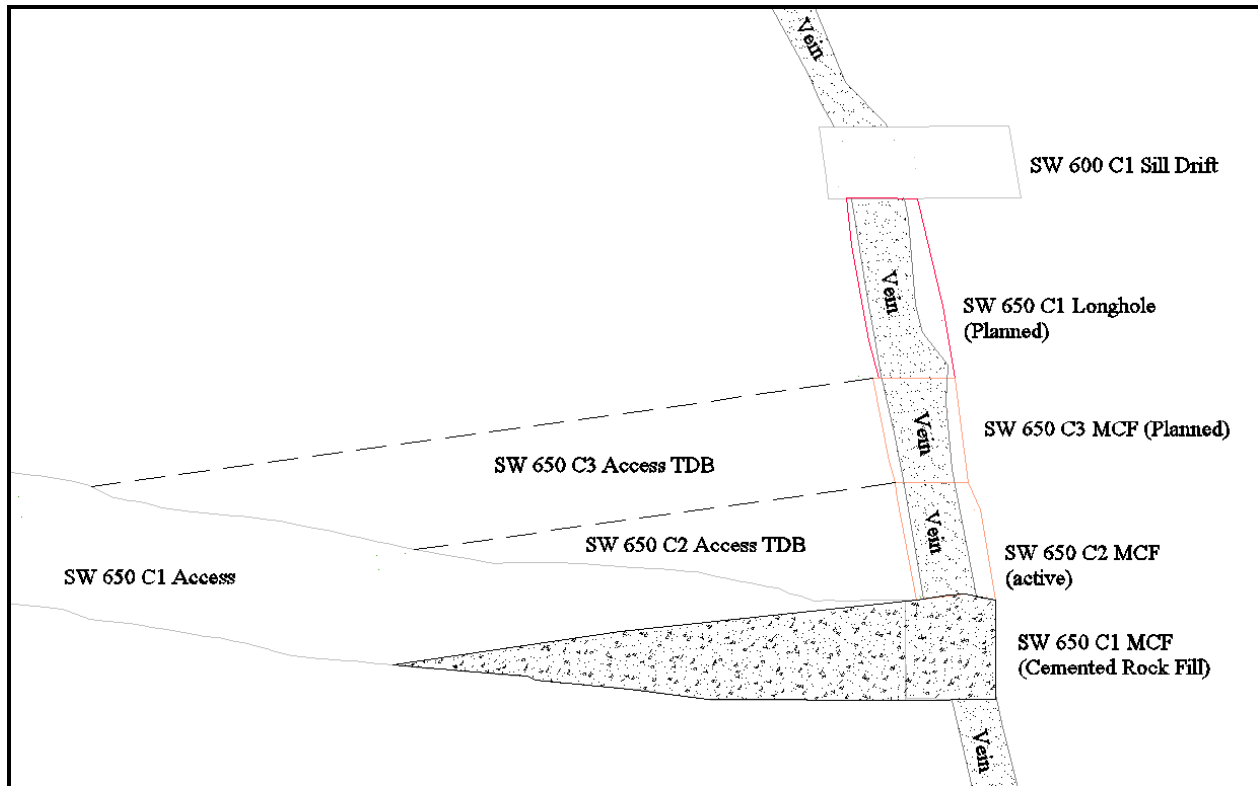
Schematic Cross-Section - Typical MCF Stope (SRK, 2013)
